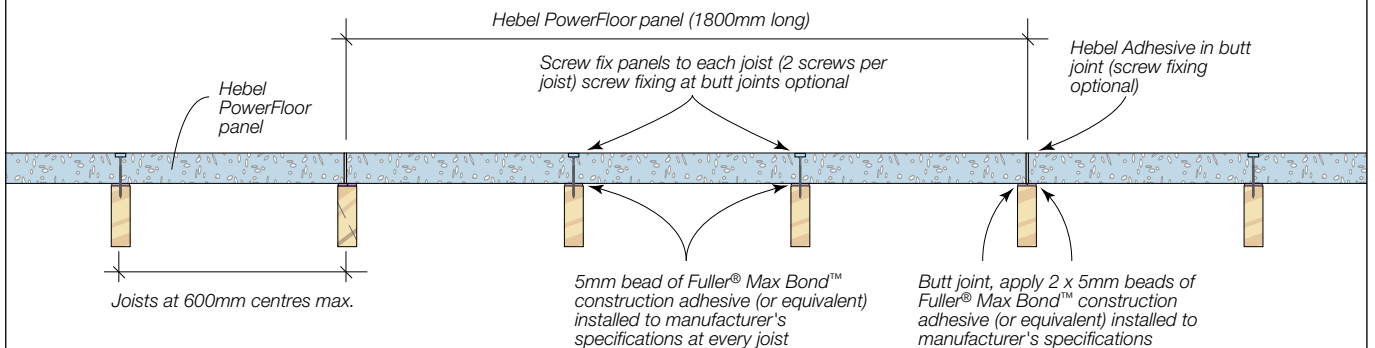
Fixing of Hebel PowerFloor Panel to Timber Joists
